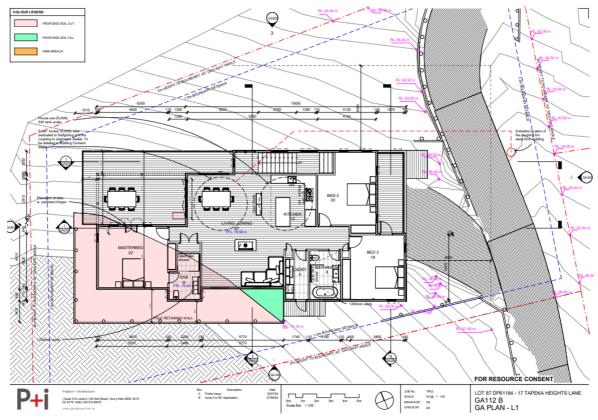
Site Plan (Source: Projects + Infrastructure)
